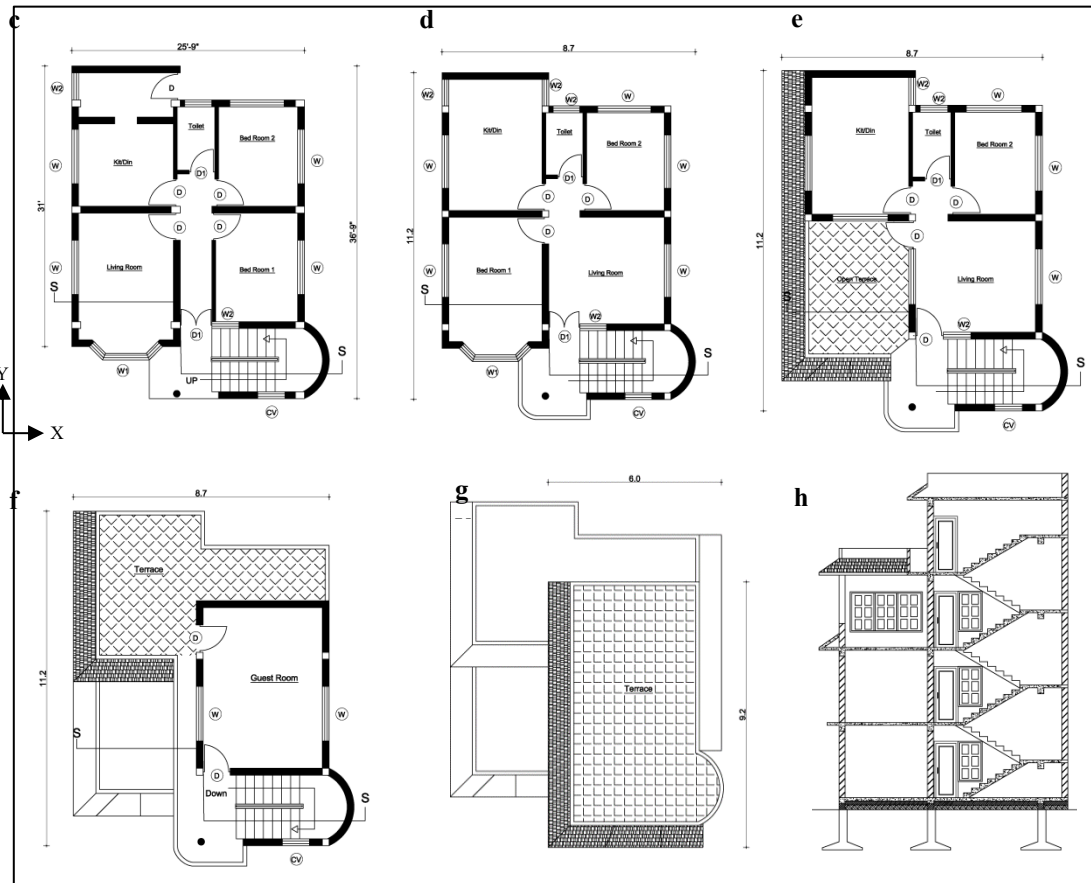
Existing plan view of building with solid brick as an infill wall: Ground floor (c), Second floor (d), Third floor (e), Fourth floor (f), Roof (g) and Section (h).
